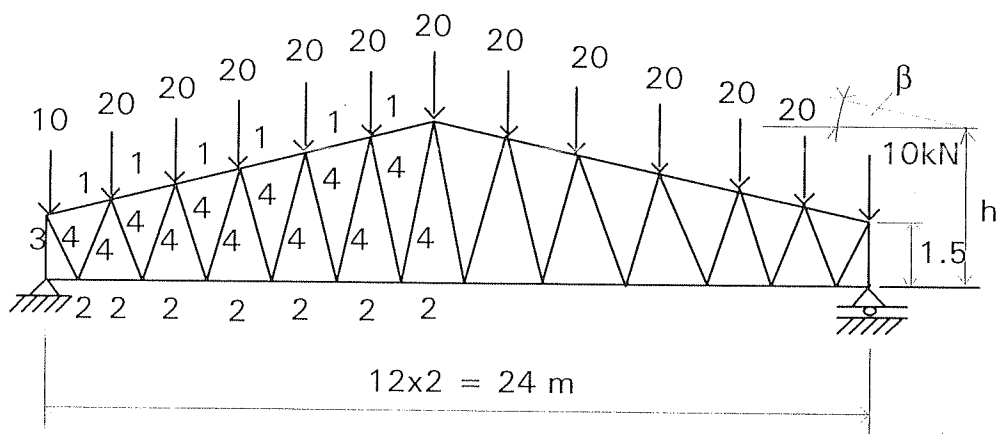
Numerical example of a roof truss. 1 - section for upper chord, 2 - section for lower chord, 3 - section for outside columns, 4 - section for braces. The height h varies with the slope angle β of the upper chord.
